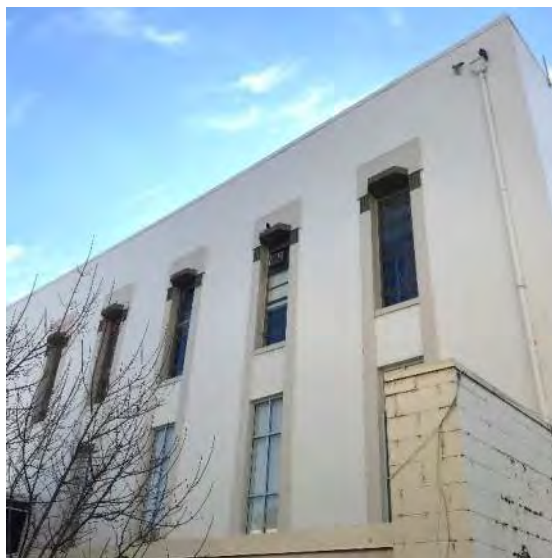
East façade, view southwest, showing fenestration pattern and material, including replacement second-floor windows and CMU enclosure (ARG, 2022)
